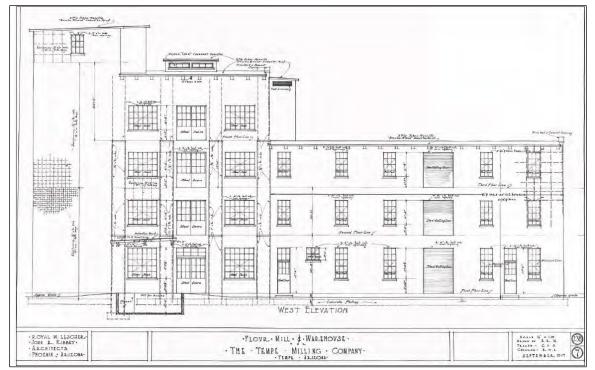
Architectural drawing of Hayen Flour Mill, 1917, west elevation (Architects Lescher & Kibbey)
